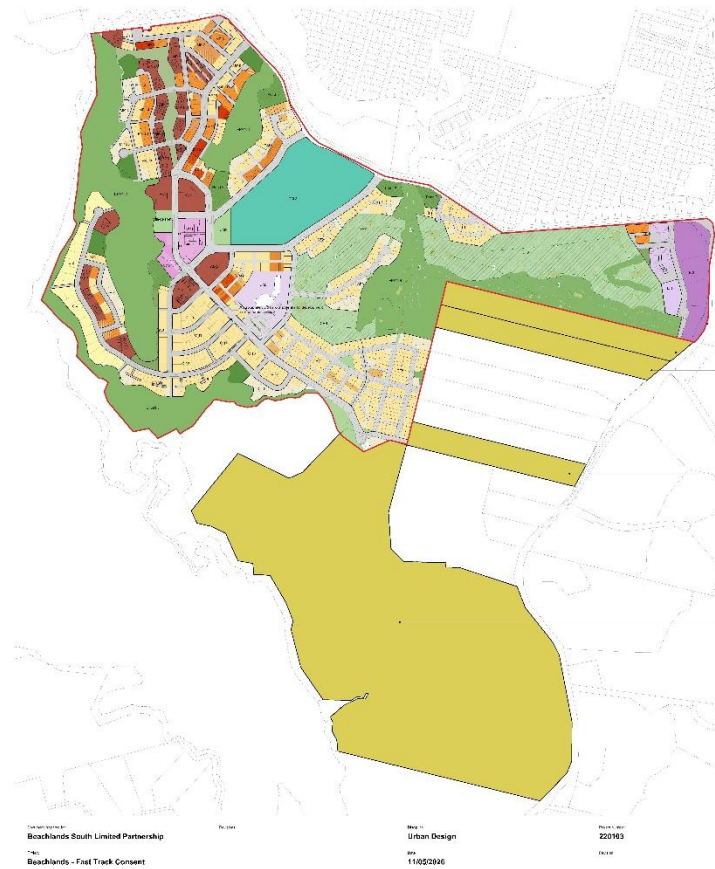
Project Master Plan and the Cut Fill Plan (source: Harrison Grierson)
